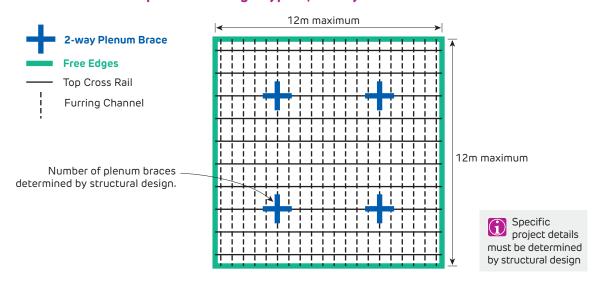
Suspended Ceiling - Type C, 2-way Plenum Braced 2-way Plenum Brace with four sides Free Plan
